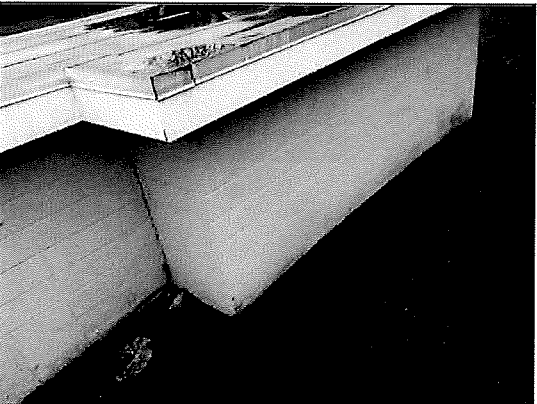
Defective grading at the Pool Equipment Building (PEB). Note open crack in the masonry at the inside corner and standing water on roof.
